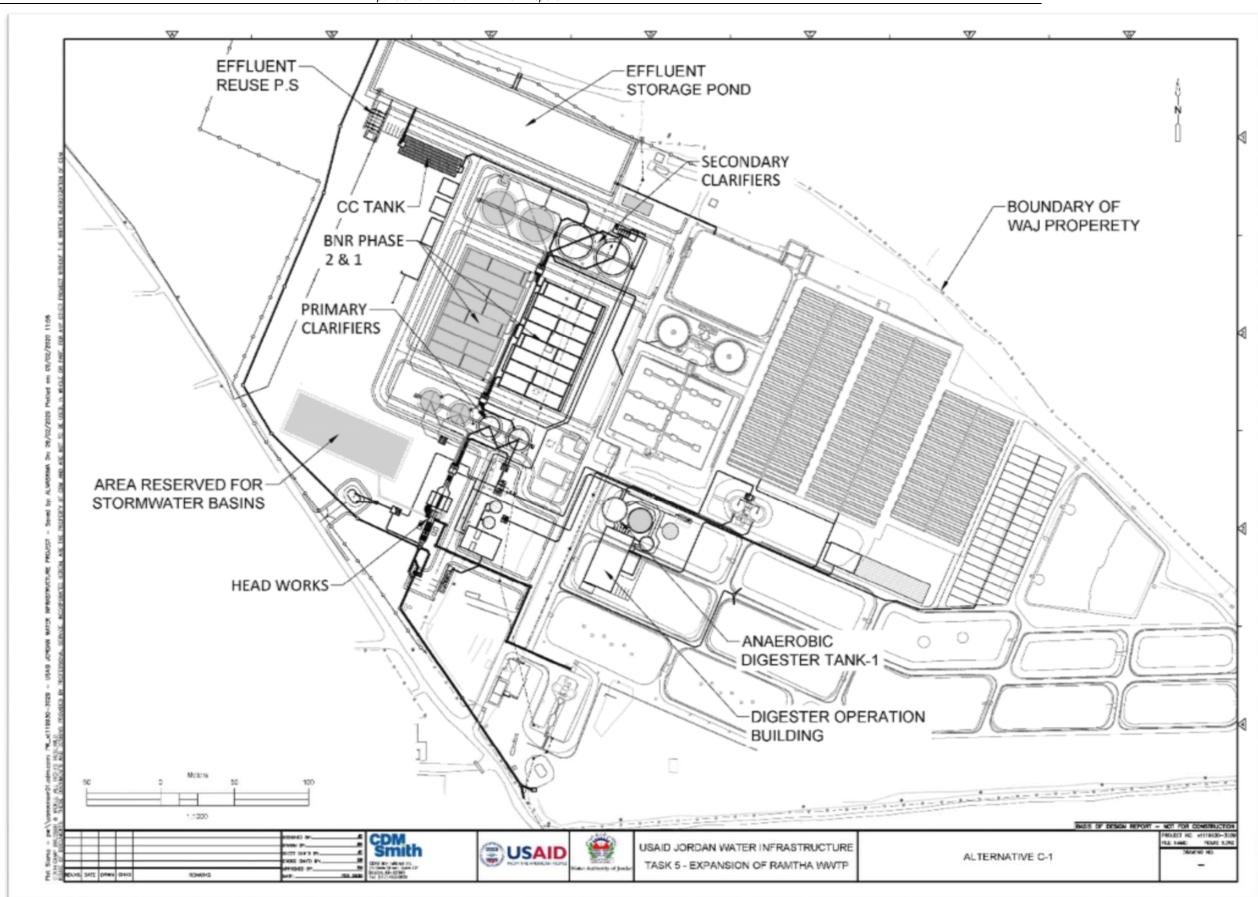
Proposed Project Site Plan (Alternative C1 – Phase 1)
